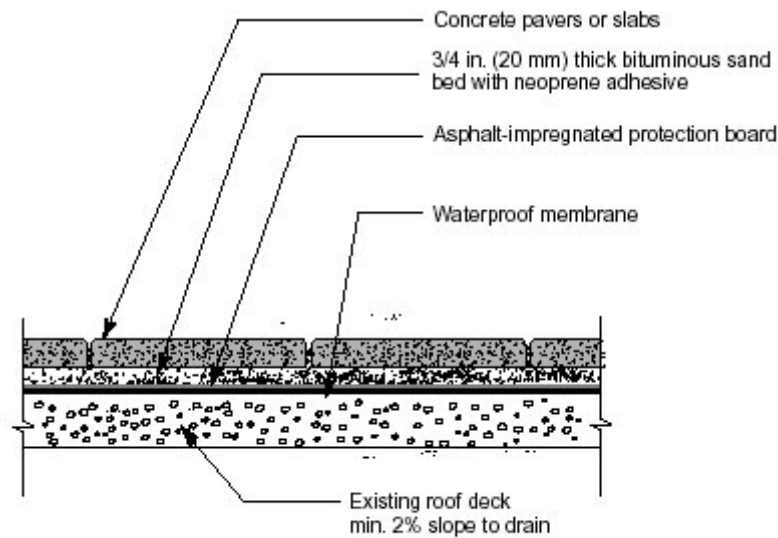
Neoprene adhesive on an asphalt-stabilized sand setting bed
